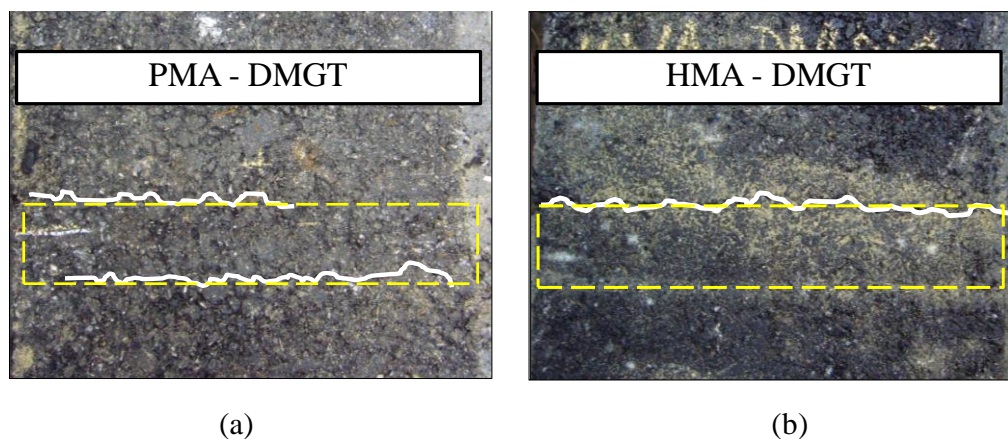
Surface cracking in overlaid reinforced with geocomposite pavements: (a) PMA pavement; and (b) HMA pavement
